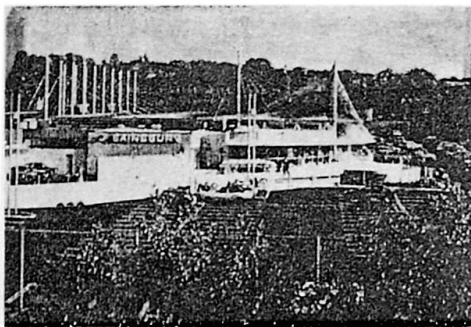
Roof at Sainsbury's Store, Canterbury
